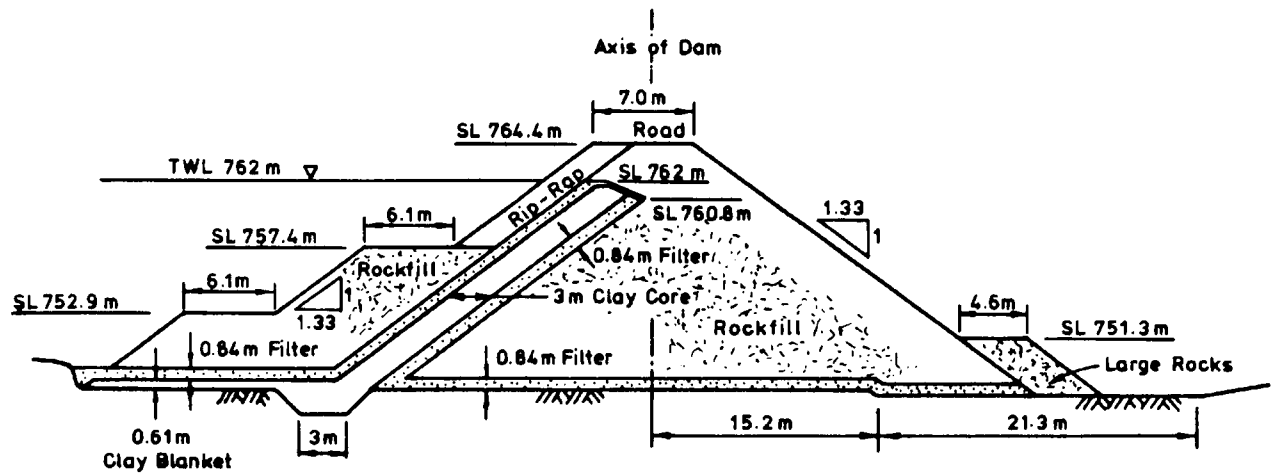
Laughing Jack Marsh Dam (after Wilkins¹)
